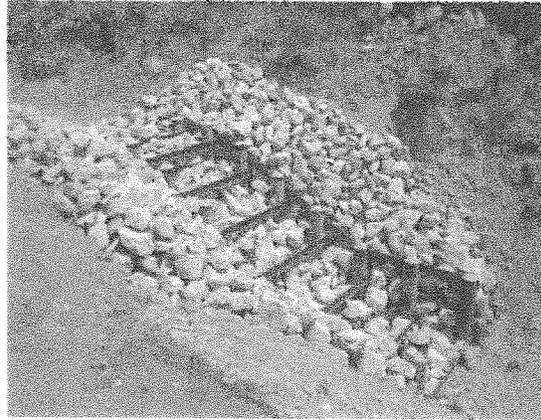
~ Ditch Stabilization: Rock filled steel piling and rails
